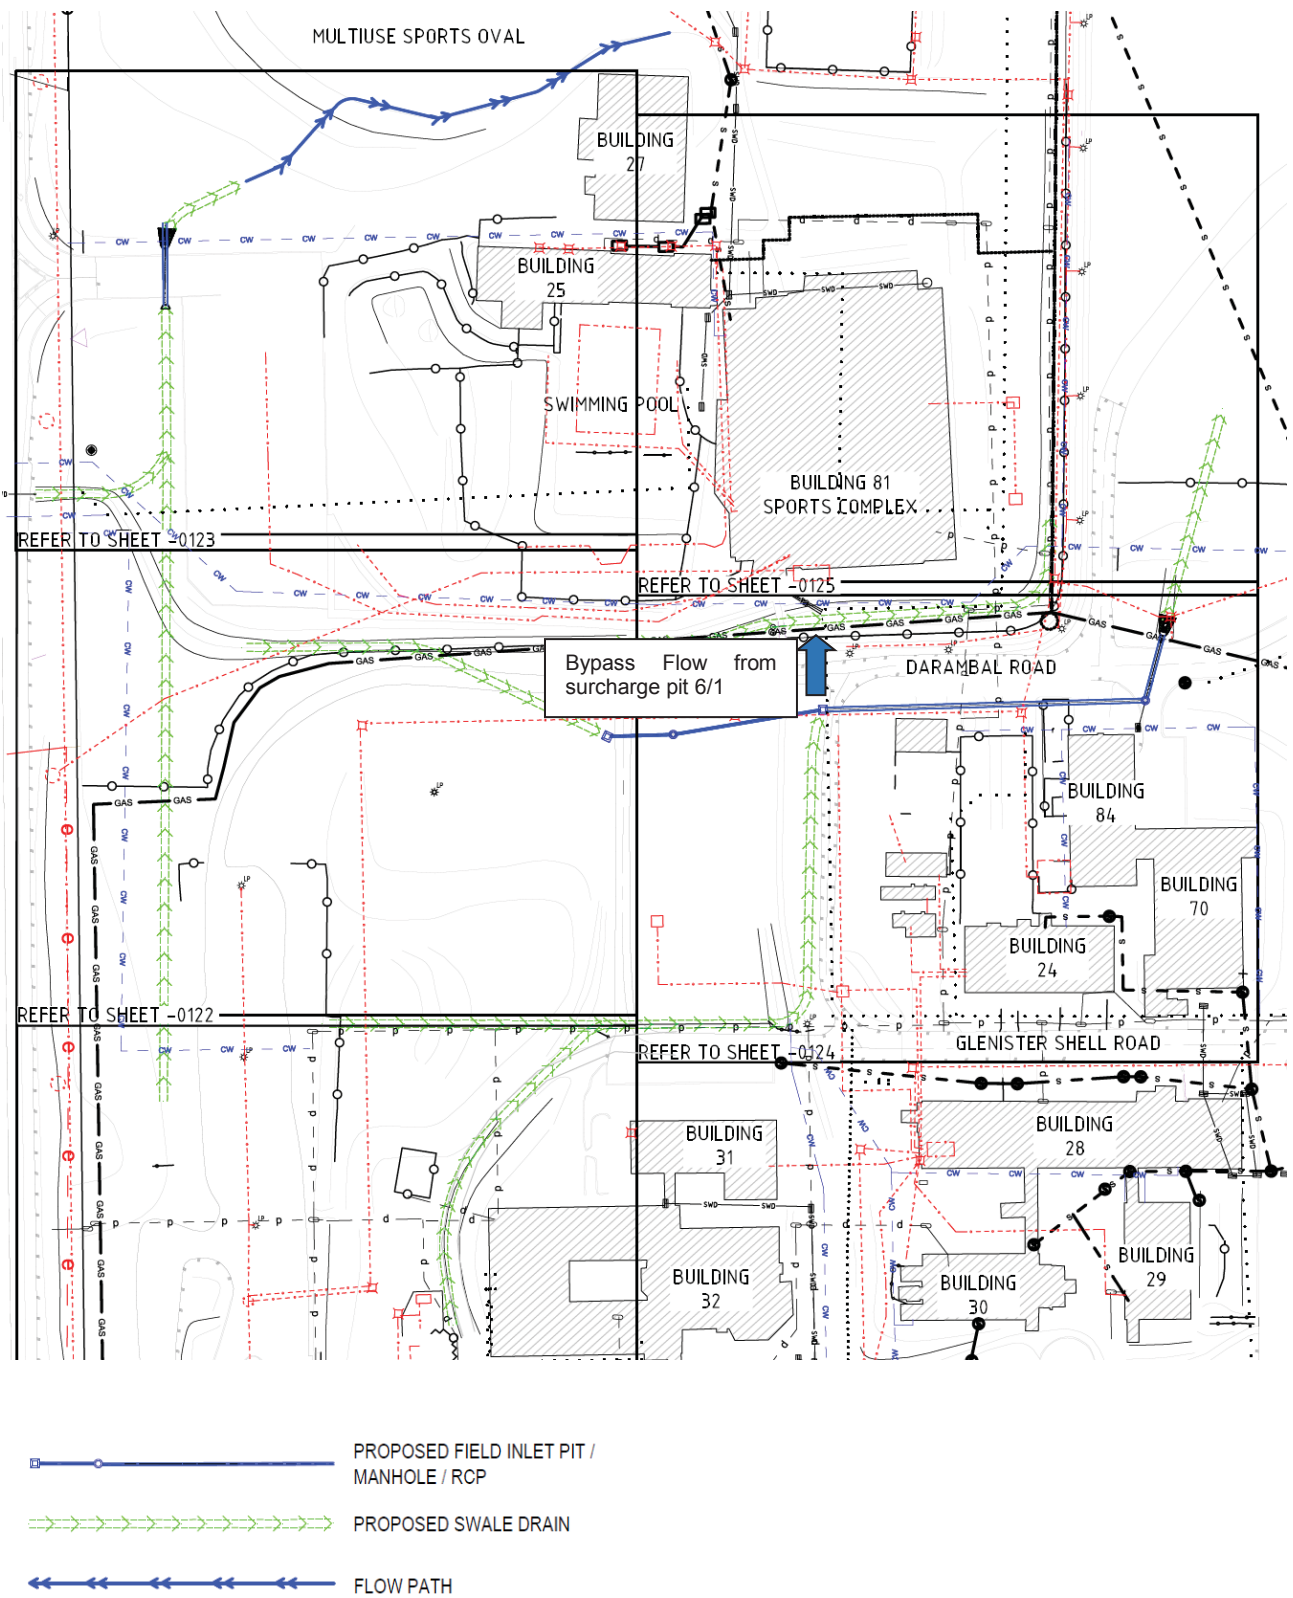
Extract from Cardno Drawing R2019052-CI-0120
